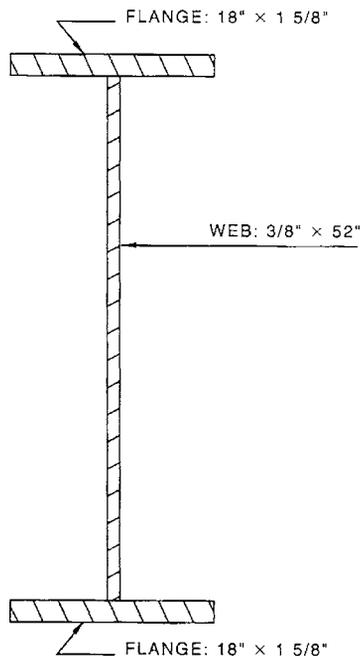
Girder with transverse stiffeners determined by LFD for a 100-ft span: $S = 1681 \text{ in}^3$; $w = 265 \text{ lb/ft}$.
